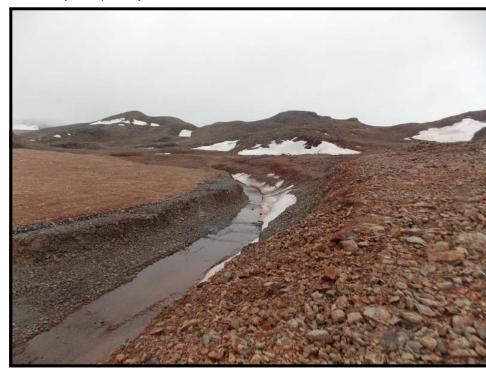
West Twin Dyke Spillway—Looking down gradient.
